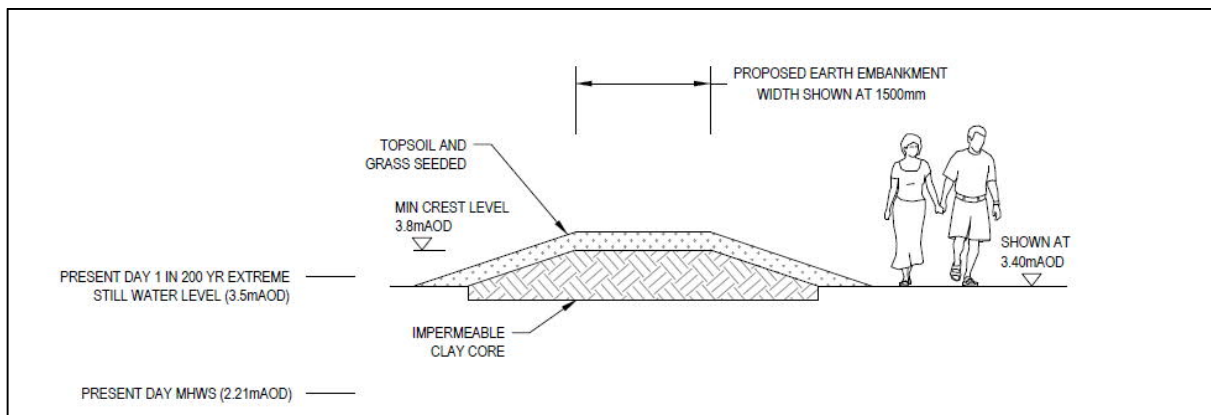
Sketch showing indicative earth embankment cross section (not to scale)
